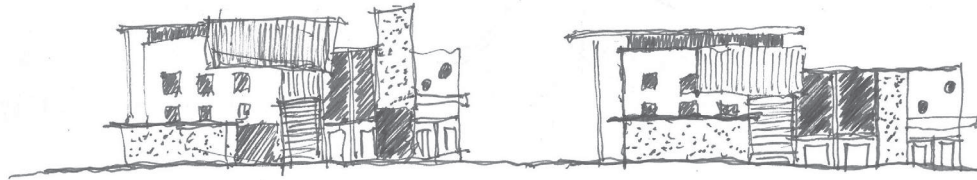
(Top) Concept of the notion of the envelope of the building being a veil, false stage wall or false facade (Author 2021).
